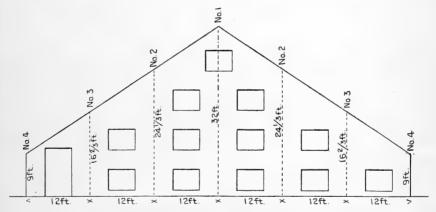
Front elevation of drying shed, windows 4 by 5 feet; door 9 feet high.
